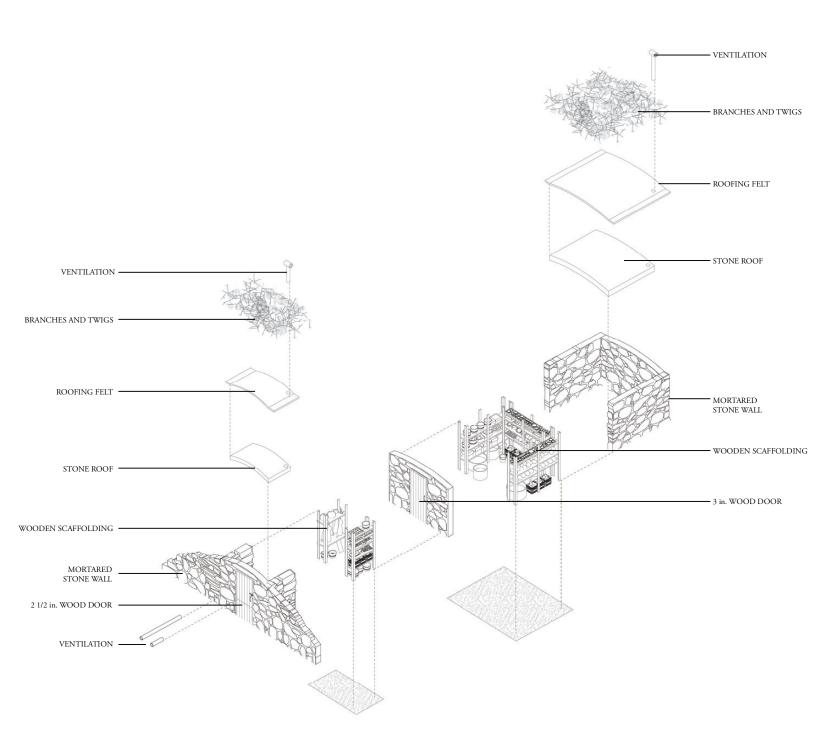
Exploded Axonometric of Typical Dug-In Root Cellar Construction
